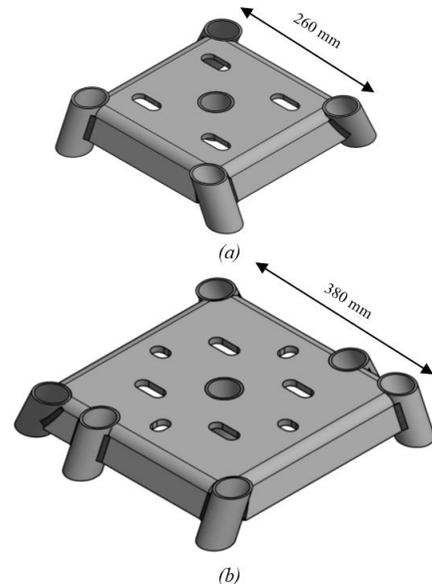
Top plate and piles configuration (a) S250 and (b) S400
